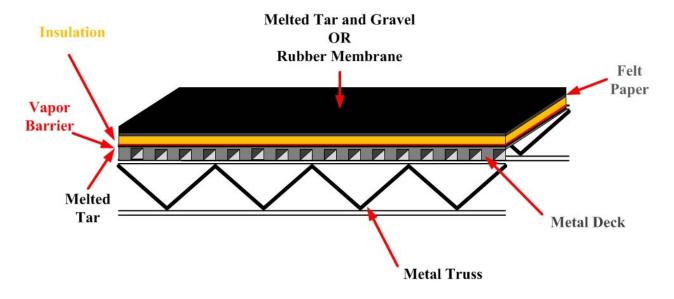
Metal Q-deck Roof Supported by Steel Bar Joist
